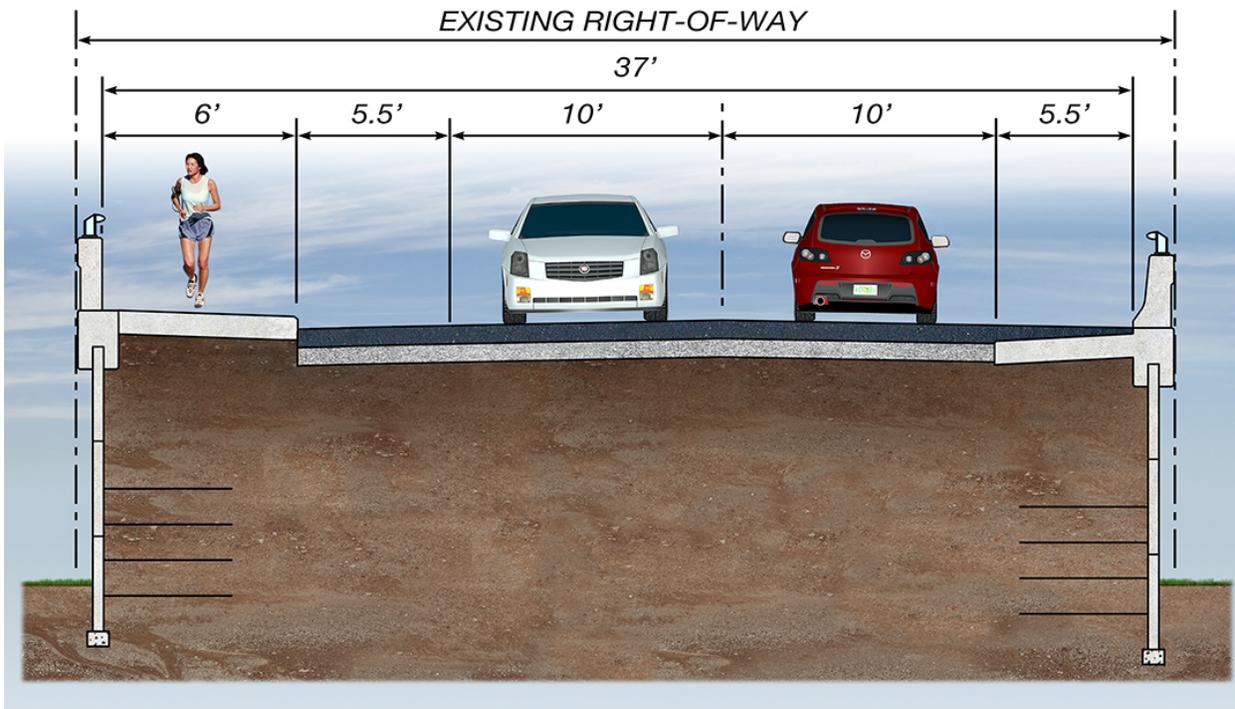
Proposed Roadway Section West of Proposed Fixed Bridge
